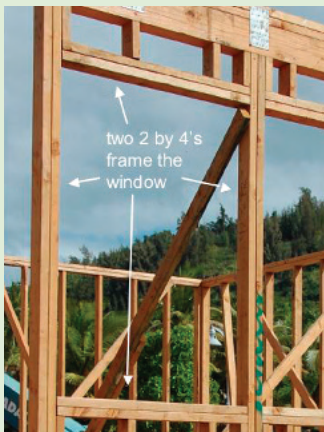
For this double-wall house under construction, two 2 by 4's frame the window. When attaching the plywood to the window, the fasteners should go into the 2 by 4's, not the siding. It is always useful to know how your house was built. Take pictures during construction (if possible), review your blueprints, drill small test holes if you have to, or ask your architect or home builder for the details on your window.
